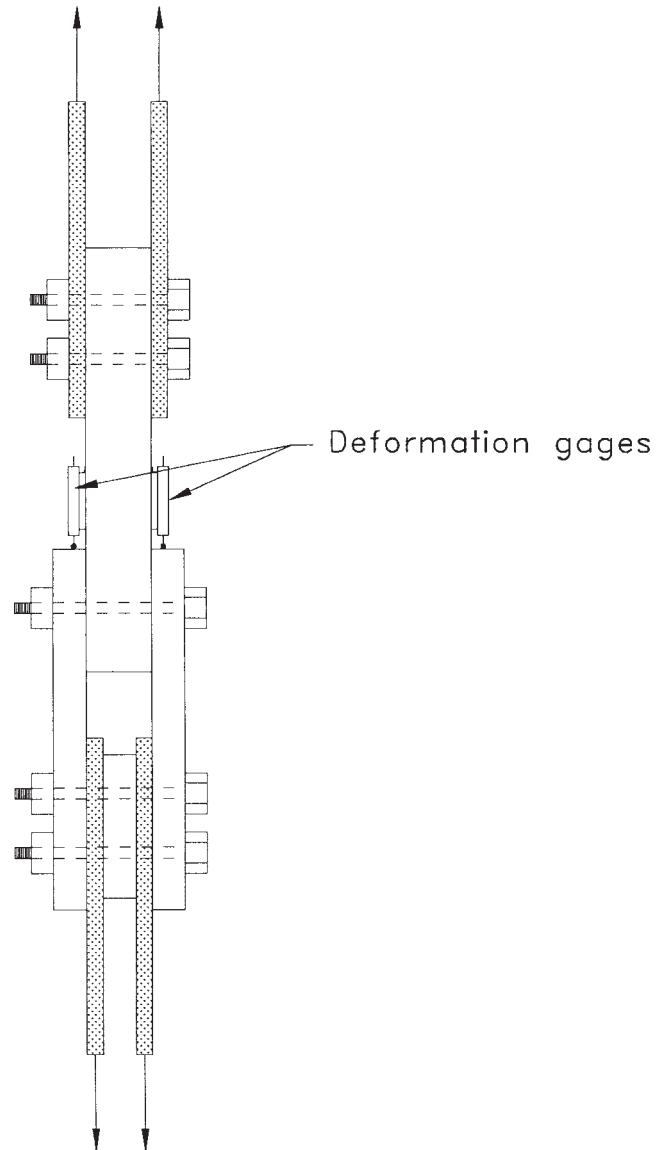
Assembly for Testing Bolted Connections Parallel to Grain in Tension
